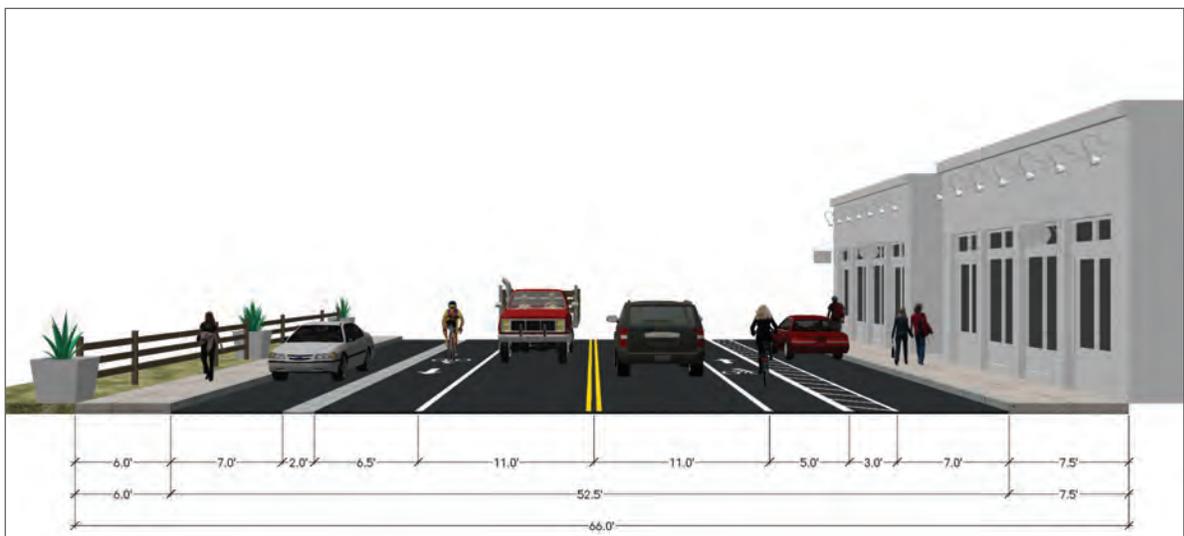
Highway 1 between OCSD Building and Railroad Street
